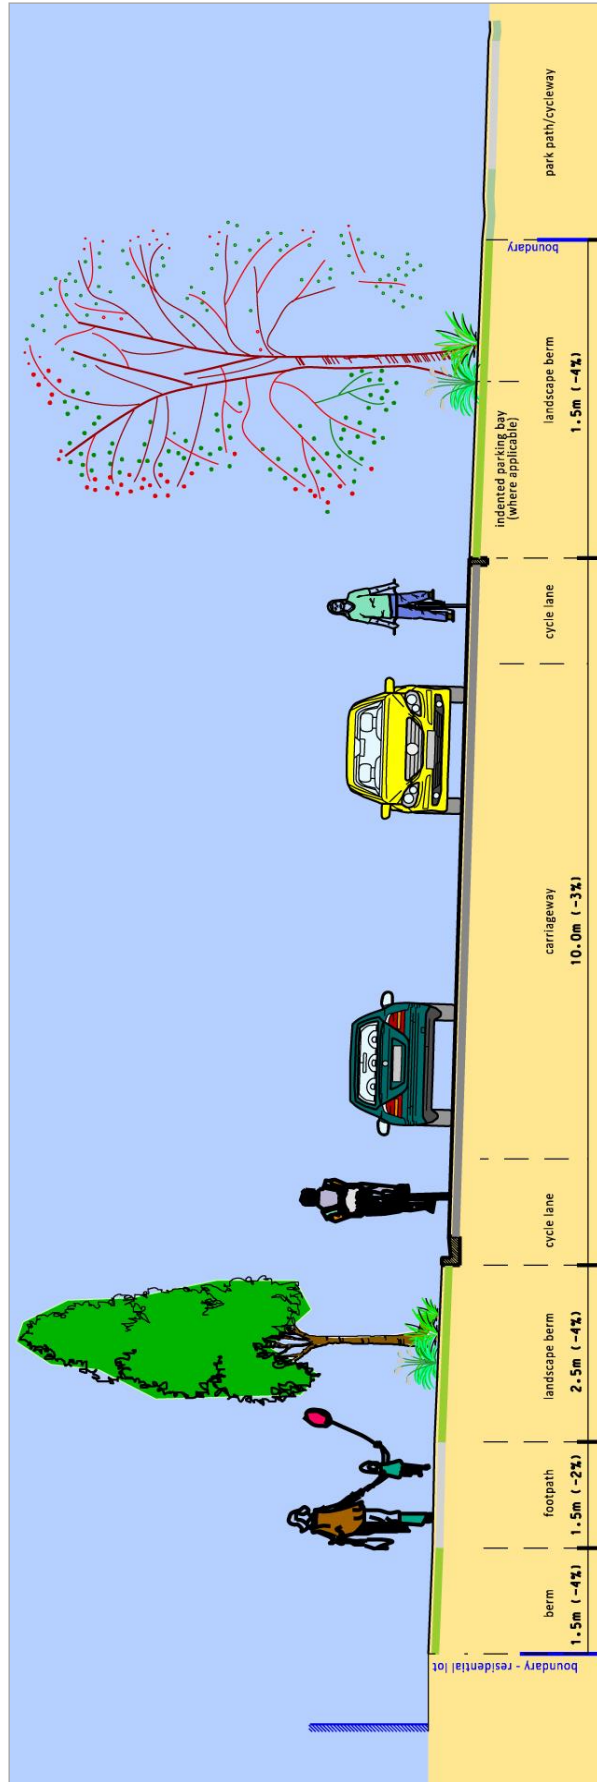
Rotokauri Cross-sections – Park Edge Street
